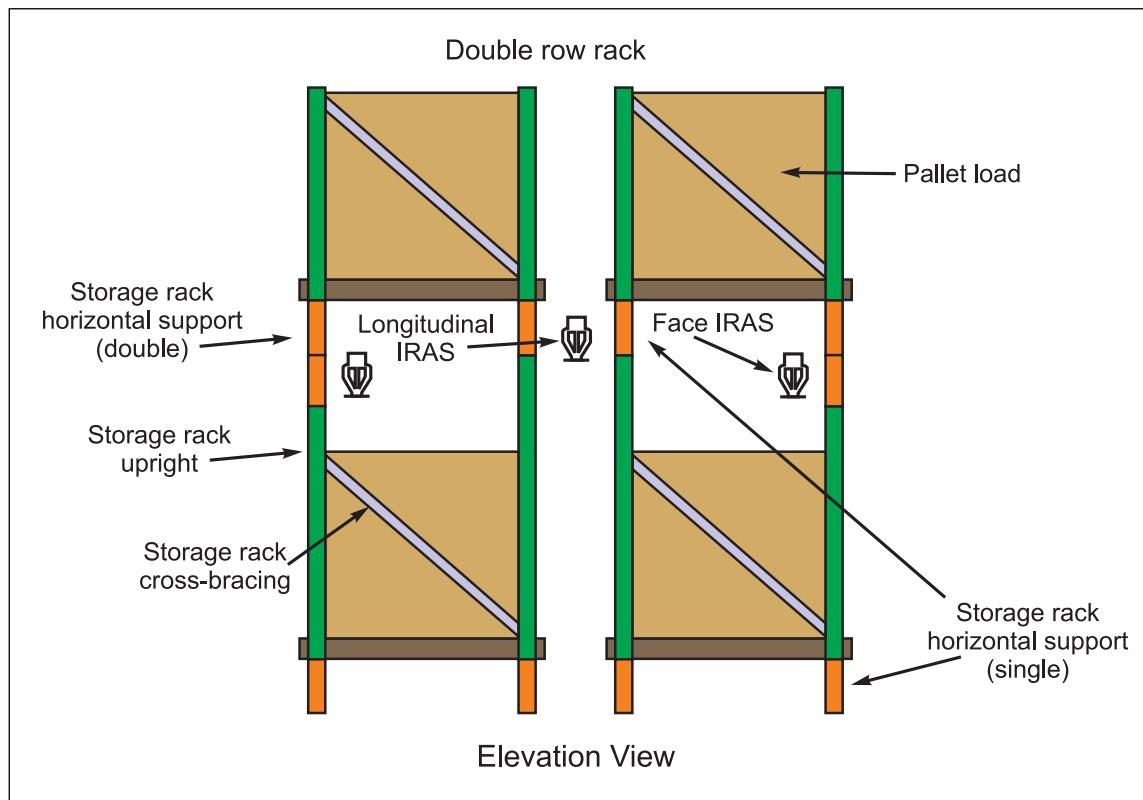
Example of protecting in-rack sprinklers and sprinkler piping in a double-row rack
